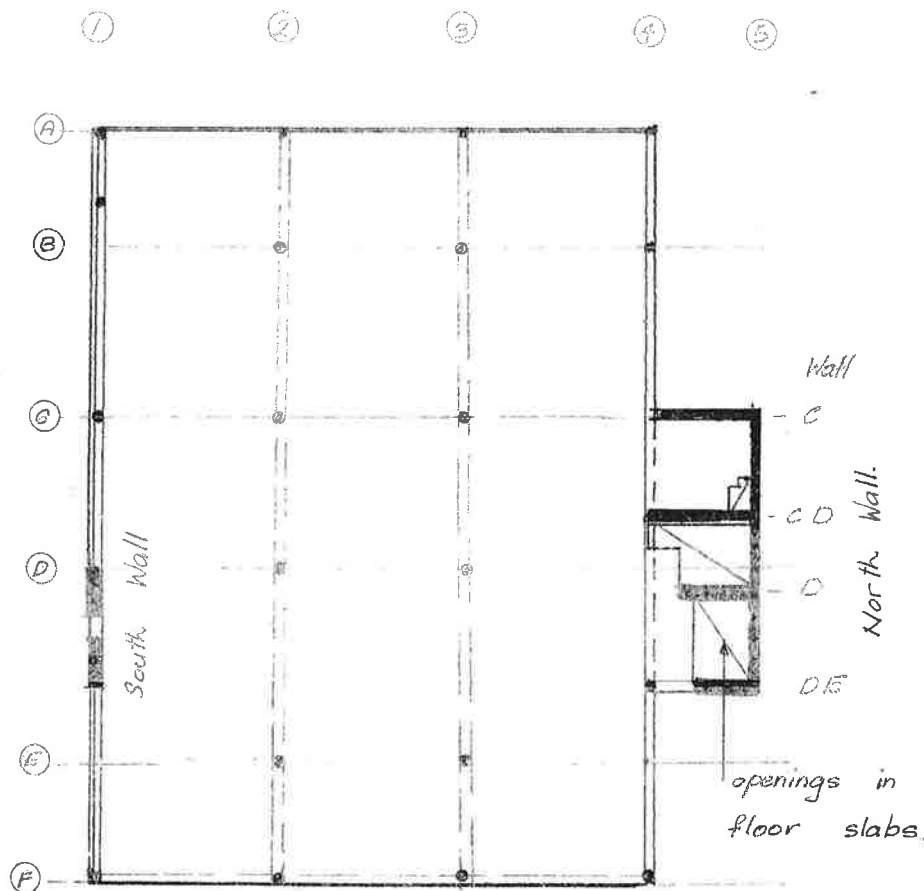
The layout of Shear Walls affects the Torsional Stability of the Lateral Load Resisting System.
